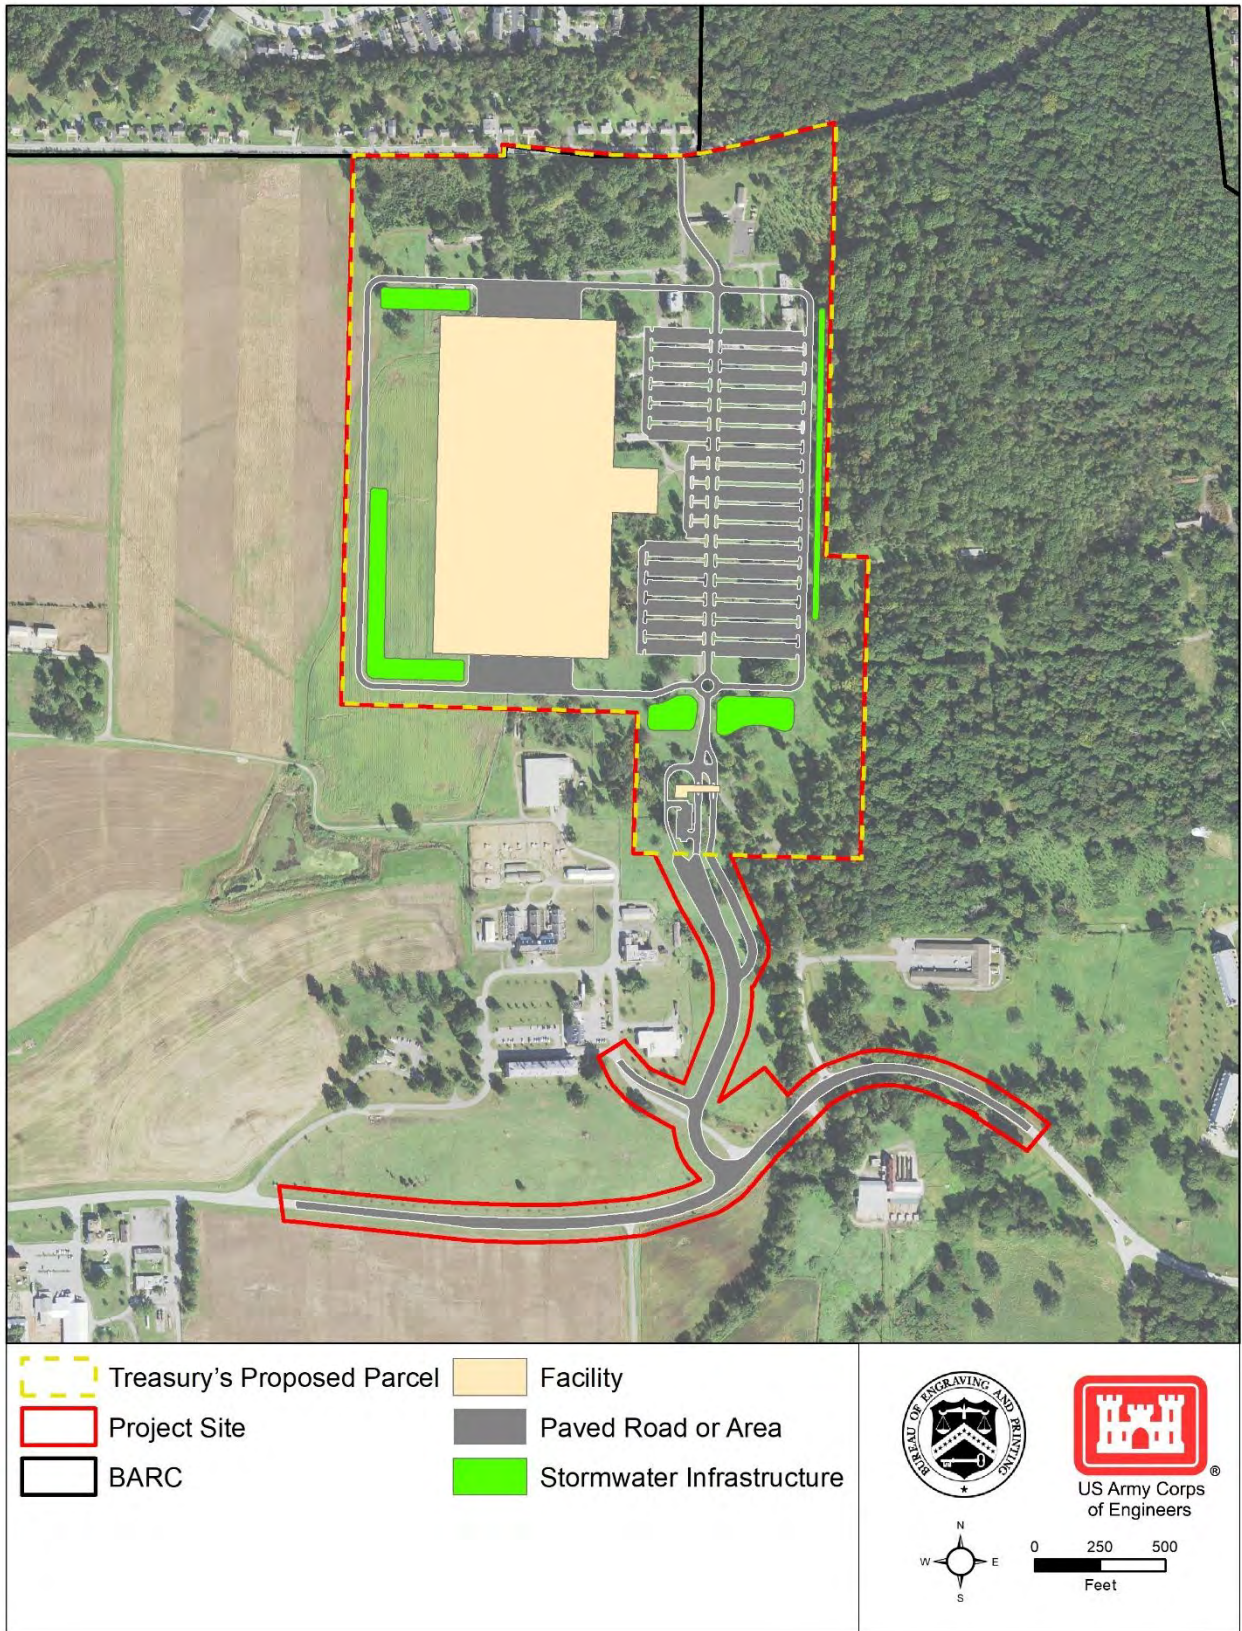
Concept Site Plan of the Preferred Alternative
